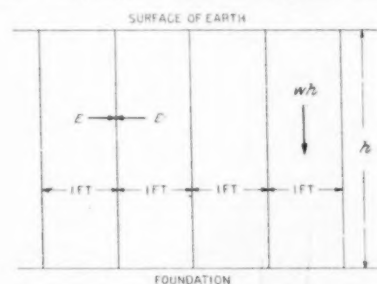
EARTH EMBANKMENT DIVIDED INTO PRISMS
